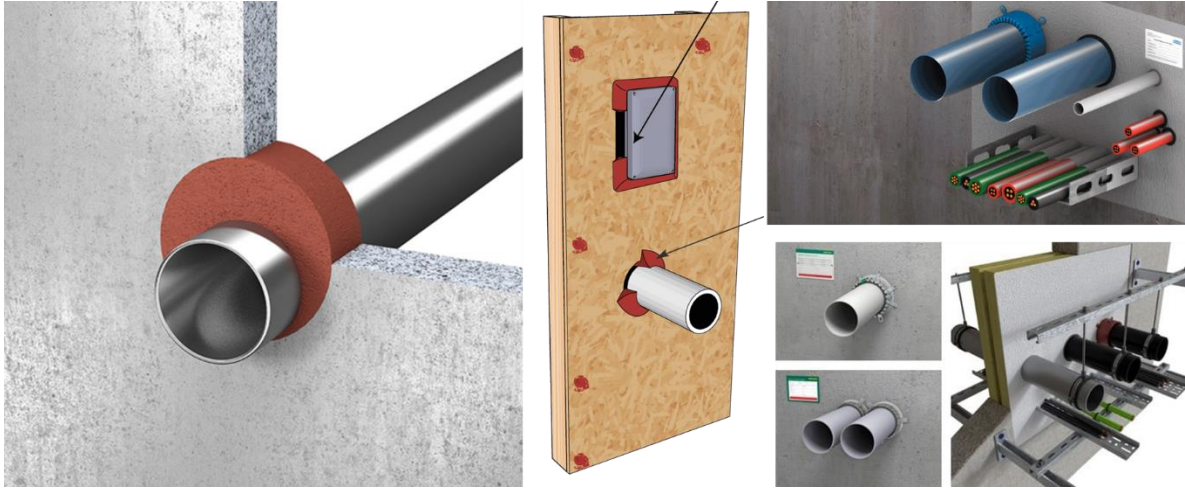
Pipes and ductwork penetrations or openings that could be found in construction projects.
